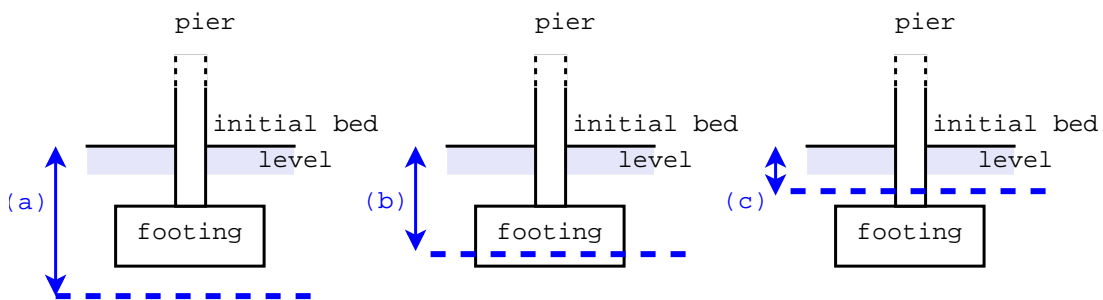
Scour levels with respect to bridge footing: (a) below footing (grades 2 and 3); (b) within limits of footing (grades 4 and 5); (c) above top of footing (grades 8 and 9).
